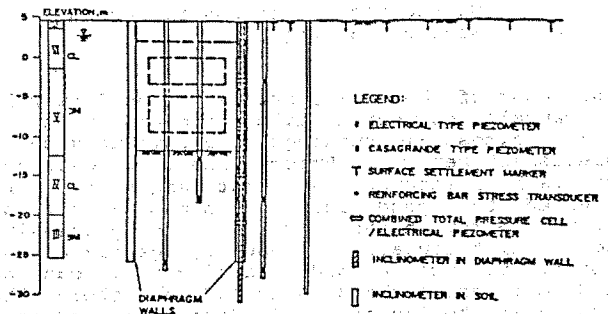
A Typical Monitoring Instrumentation Layout for a Cut-and-Cover Section
